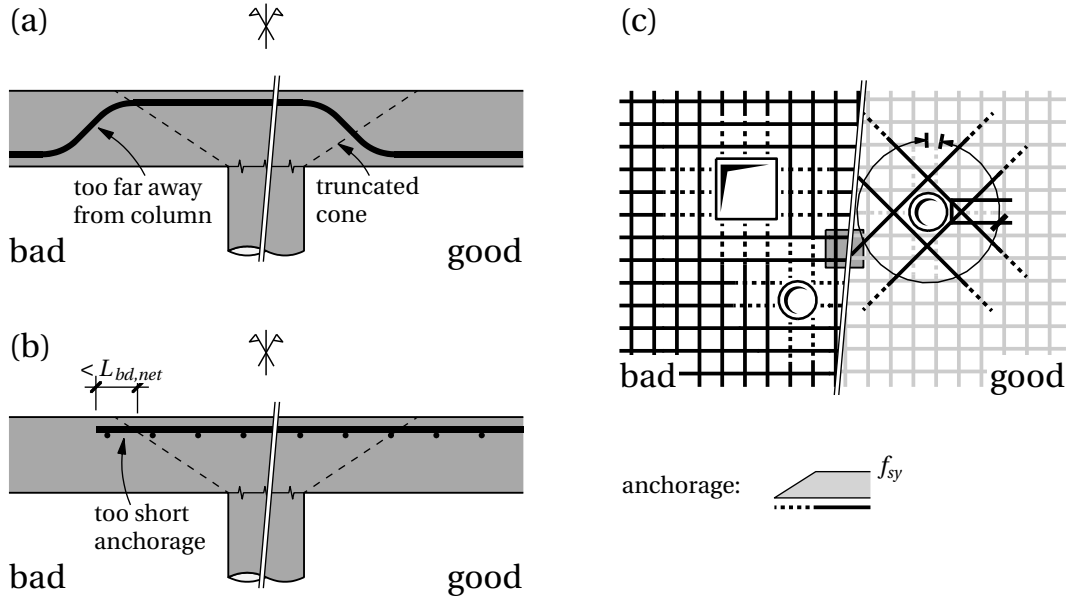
Detailing deficiencies: (a) shear reinforcement outside the truncated cone; (b) insufficient anchorage length of top reinforcement; (c) cut rebars for openings
